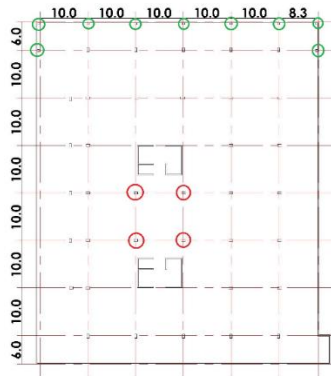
Alterations made shown in the parking floor with 10m spans.
